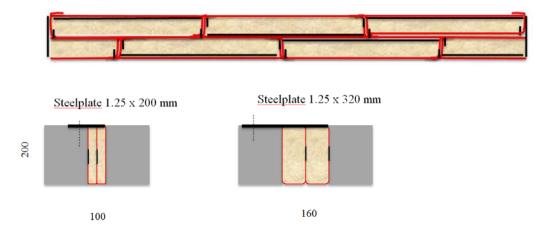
Top view and cross sections of semi-brick bond lay-out applied Firetight® (with steel plates).
